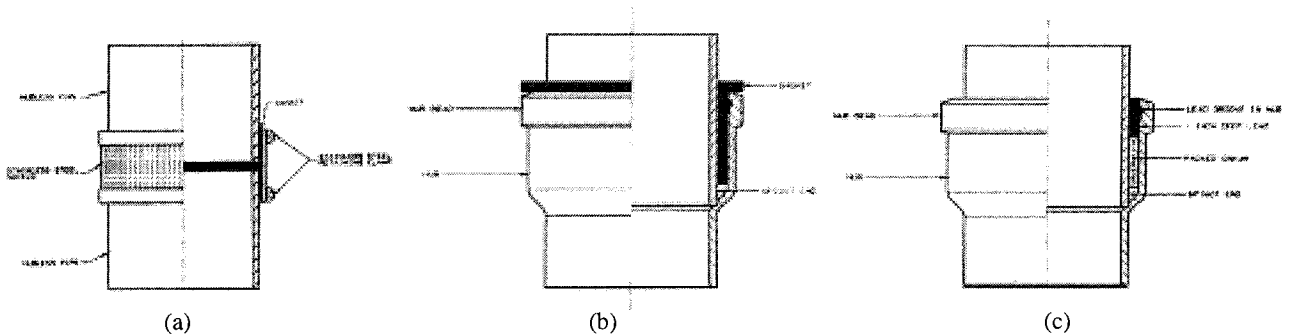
Typical Joints Used to Connect Cast Iron Soil Pipe and Fittings: (a) Typical Hubless Coupling; (b) Compression Joint; (c) Lead and Oakum Joint.
